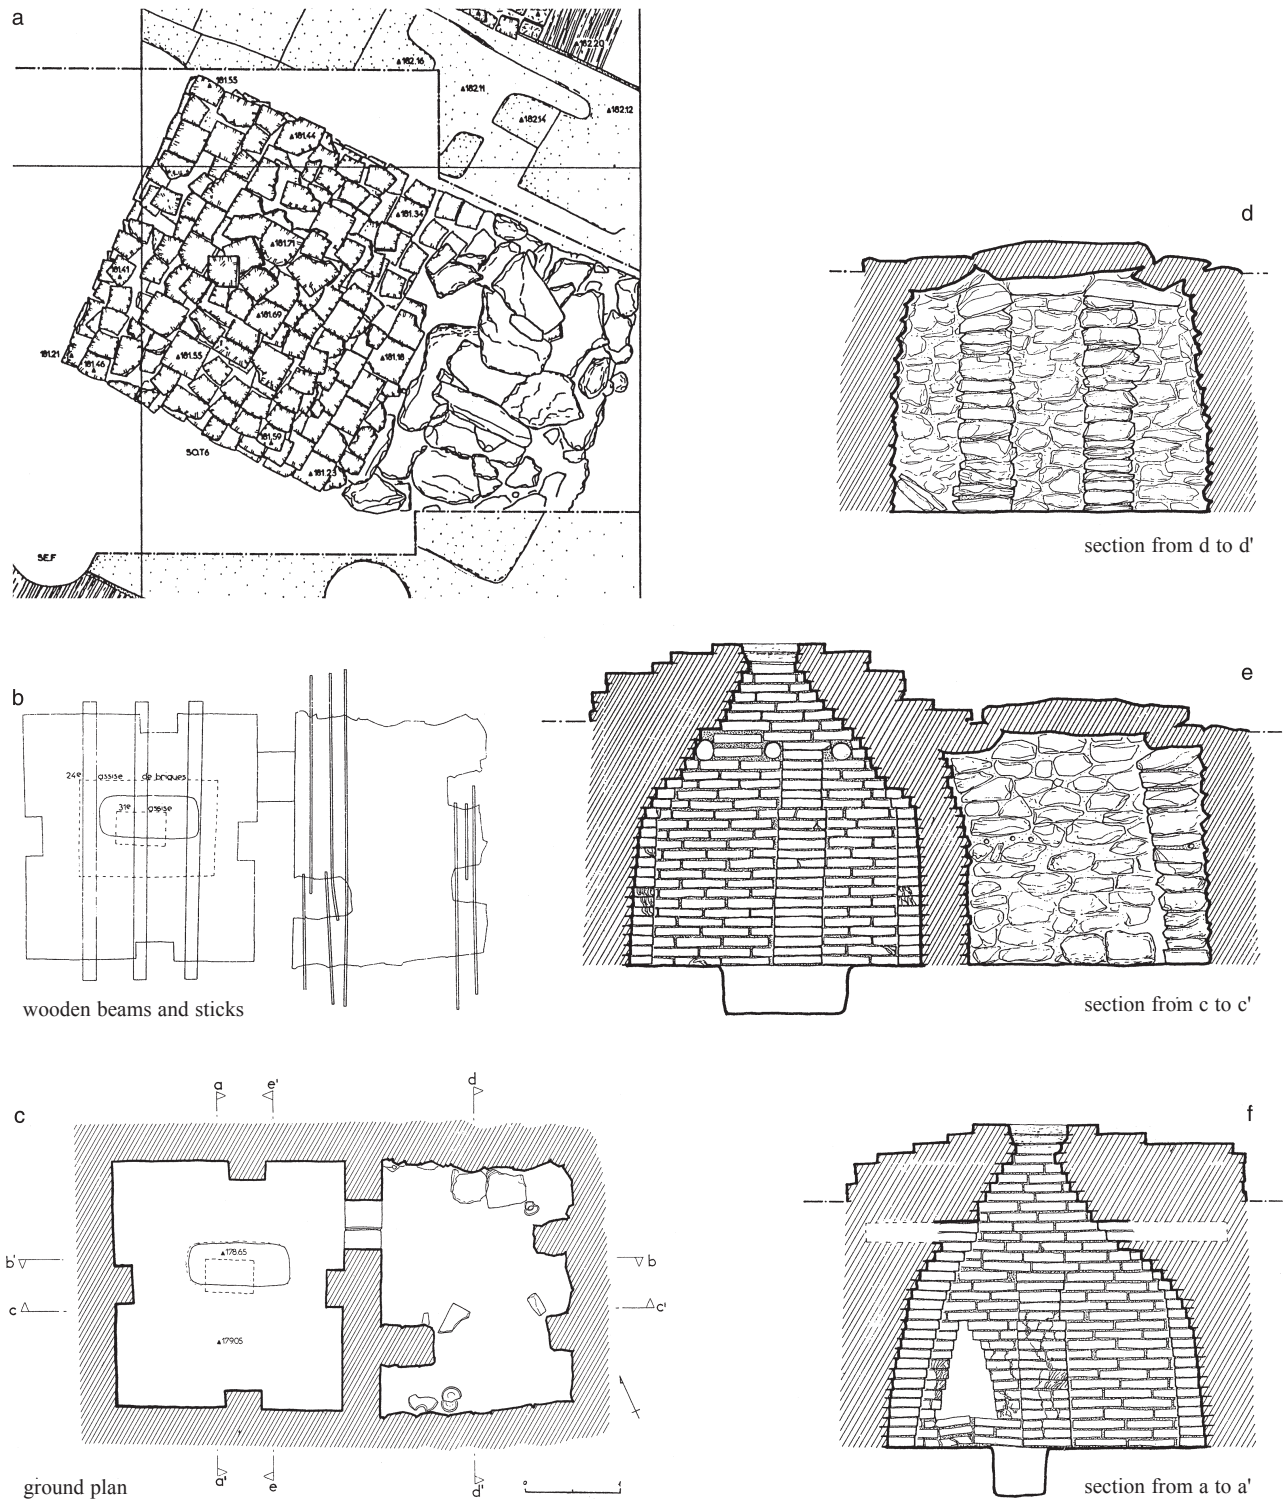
The tomb under hall I of the Little Eastern Palace of City III: [a] plan; [b] beams and wooden rods; [c] plan on the ground; [d] cross-section from d to d'; [e] cross-section from c to c'; [f] cross-section from a to a'.
